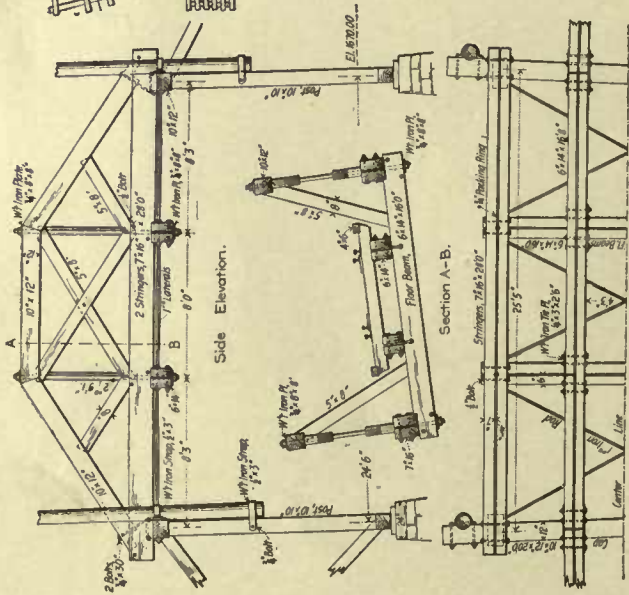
DETAILS OF WOODEN TRUSS SPAN OVER STREET.
